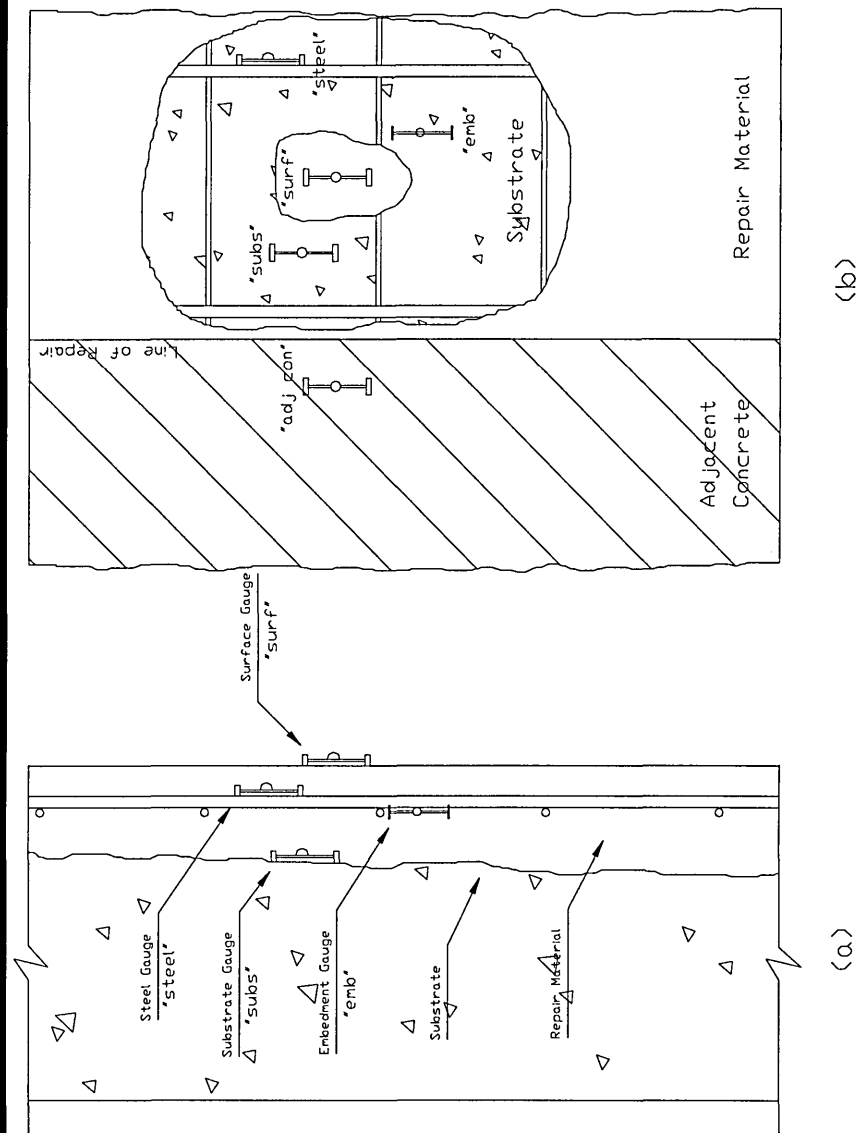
Location of gauges within a typical repair (pier and abutment) at Lawns Lane Bridge:
